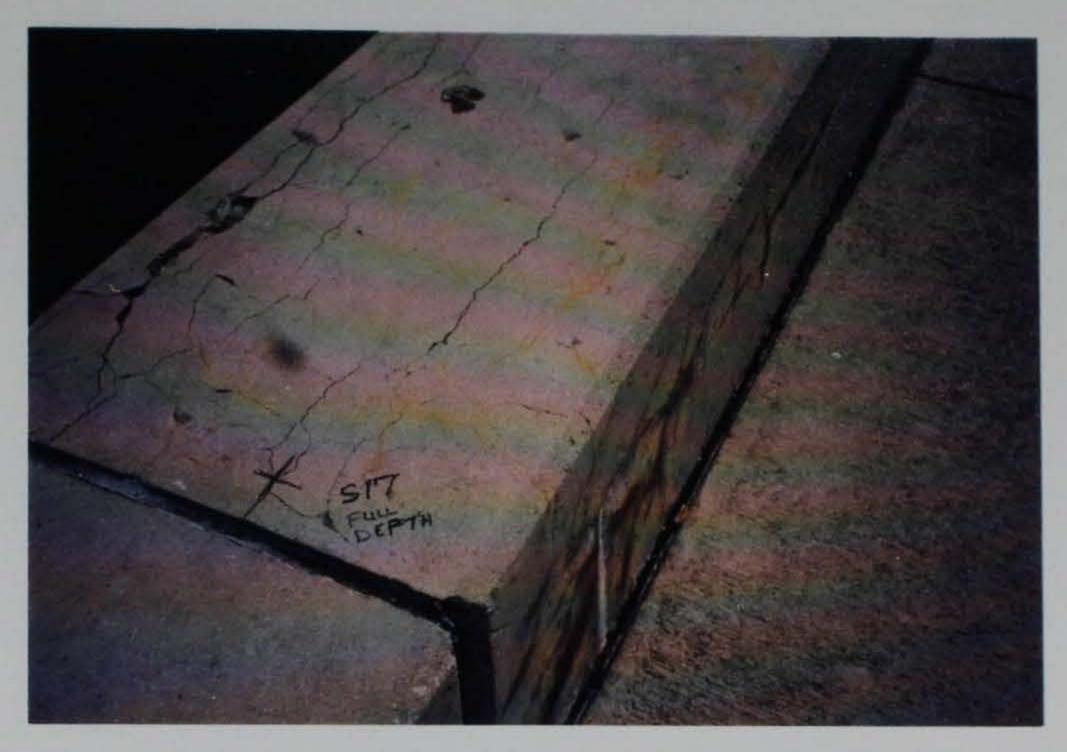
Cracks and stains in faces of south seawall monolith S17 at joint 17/18
